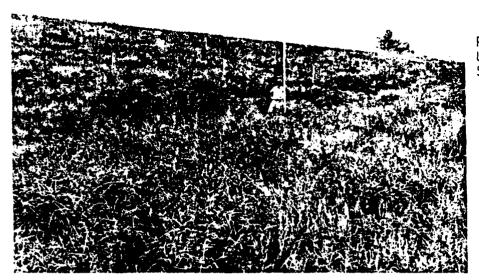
UPPER END OF SEEPAGE SPOT AT STATION 0+50±
